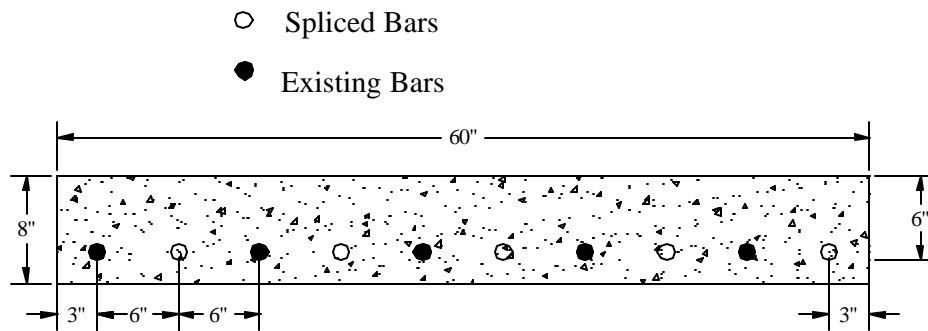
Test Series 1 - 3, Specimen B reinforcement spacing and depth.
